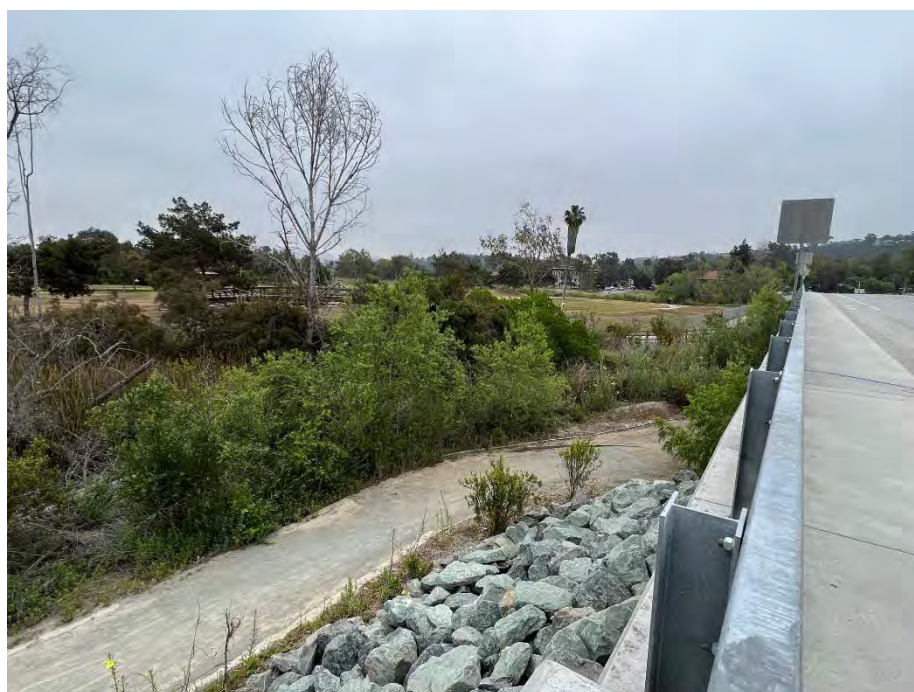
the trail in Photo 17 goes under the Willow Street Bridge and joins the trail on the west side of the bridge. (May 26, 2022).
